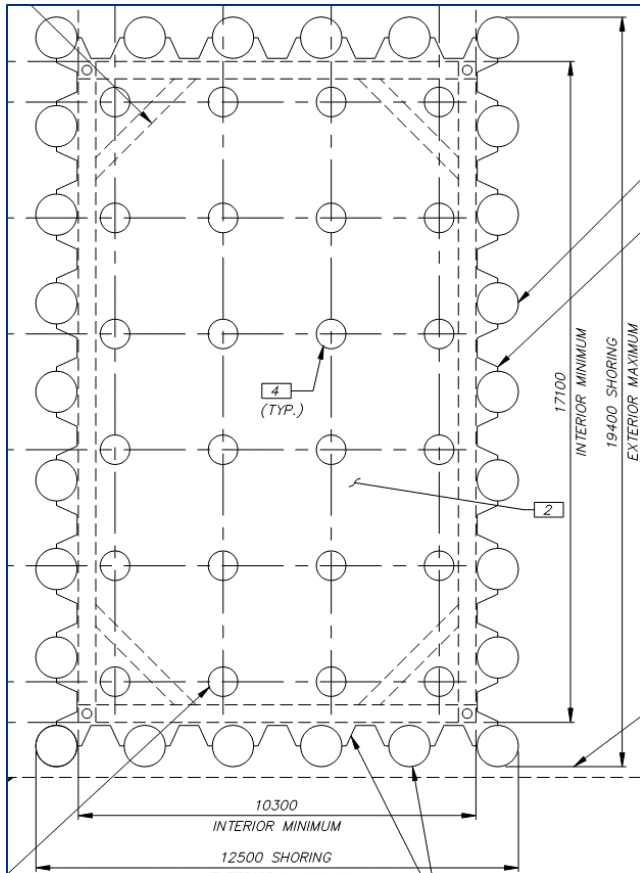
Outfall Tunnel and Diffuser Manifold Plan (Drawing Number A61C0005)
